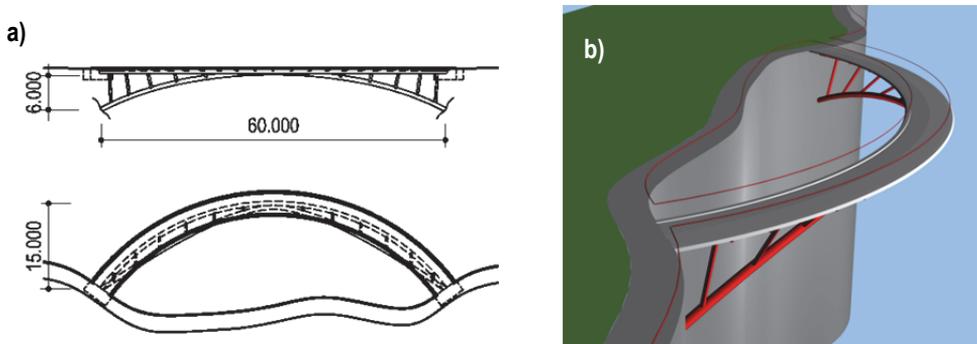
Bridge supported by the arch – a) elevation and plan, b) visualization
